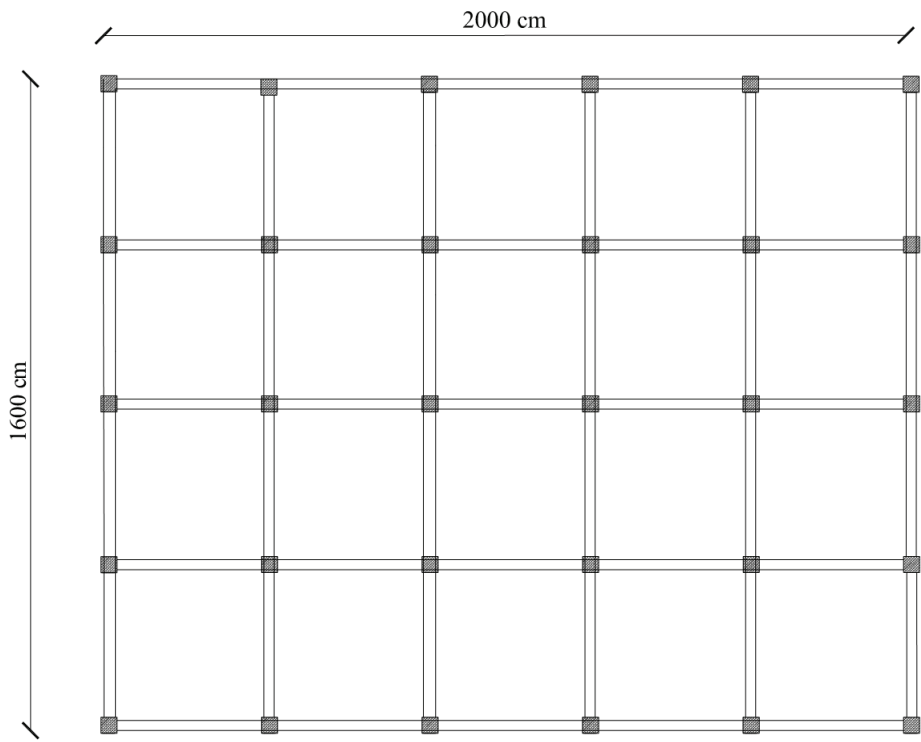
Floor plan of structure A ($T=0.49$ sec, $GDF=0$)
